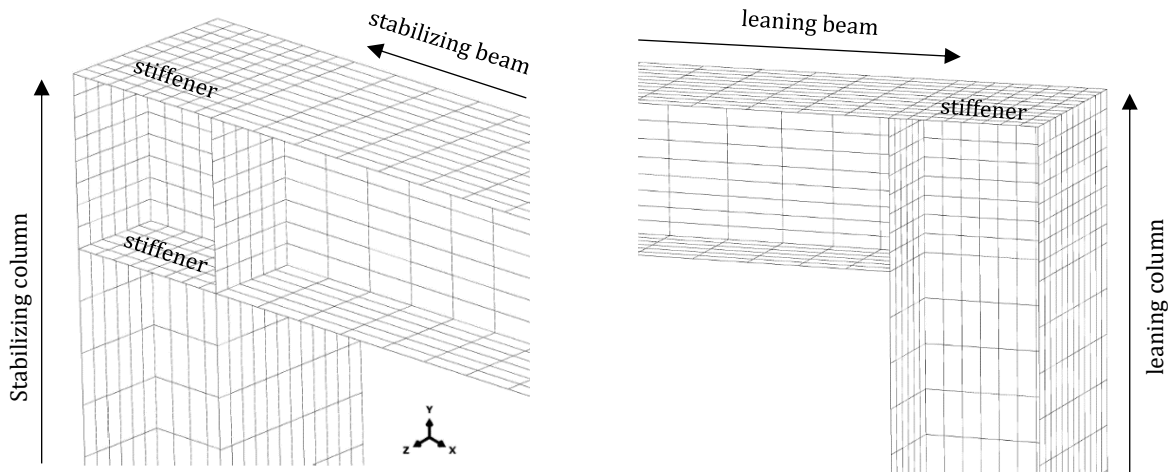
Column-beam joint for the stabilizing frame (left) and leaning column (right) in the FE-model
